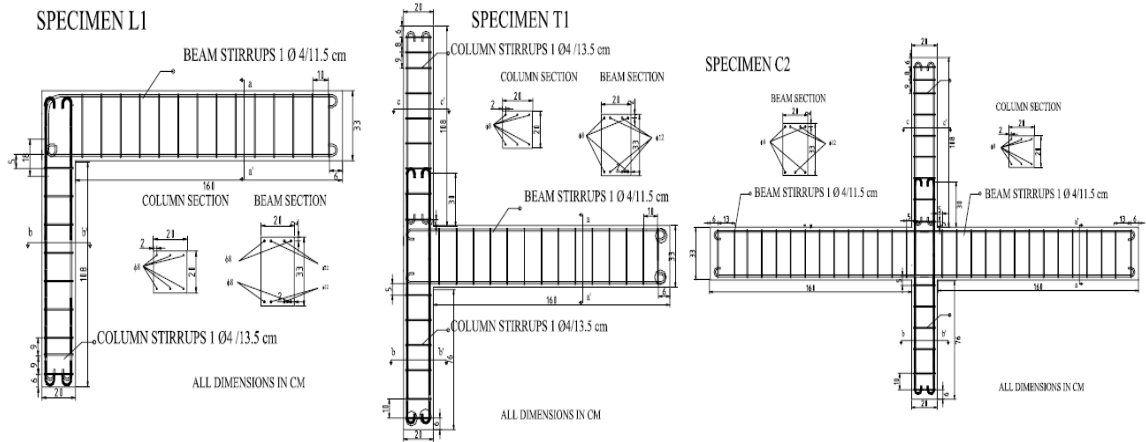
(a) Knee joint (b) Tee joint and (c) Interior joint sizes and reinforcement details [Pampanin, Calvi et al. 2002]
